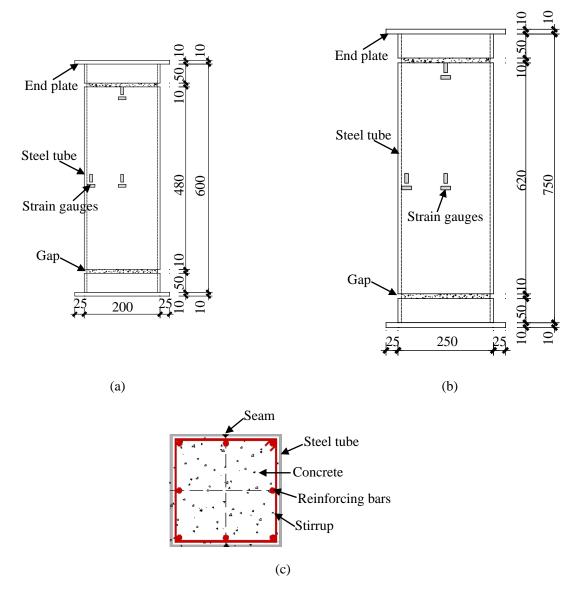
Details of specimens: (a) elevation of S200 specimen; (b) elevation of S250 specimen; and (c) cross-section (unit: mm).
